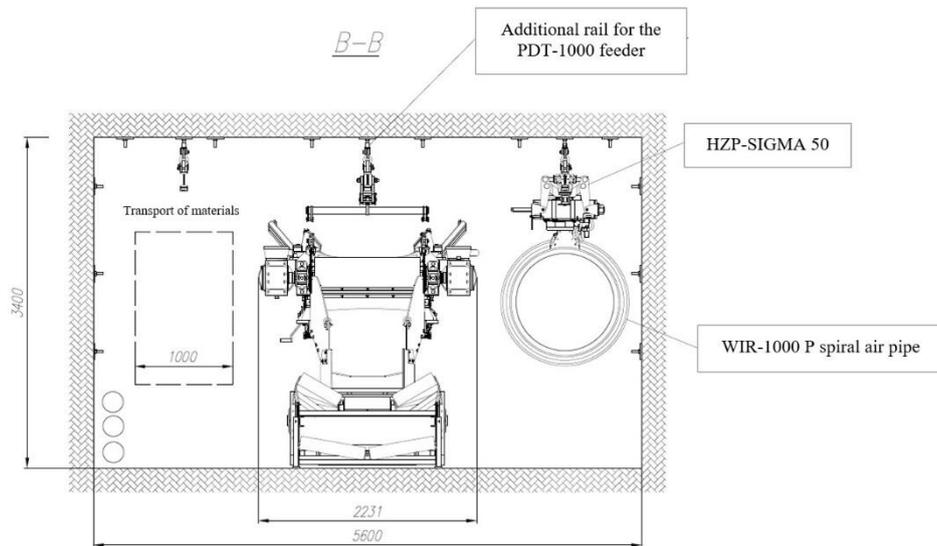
Cross-section of the working with installed WIR-1000P air pipe [135]
